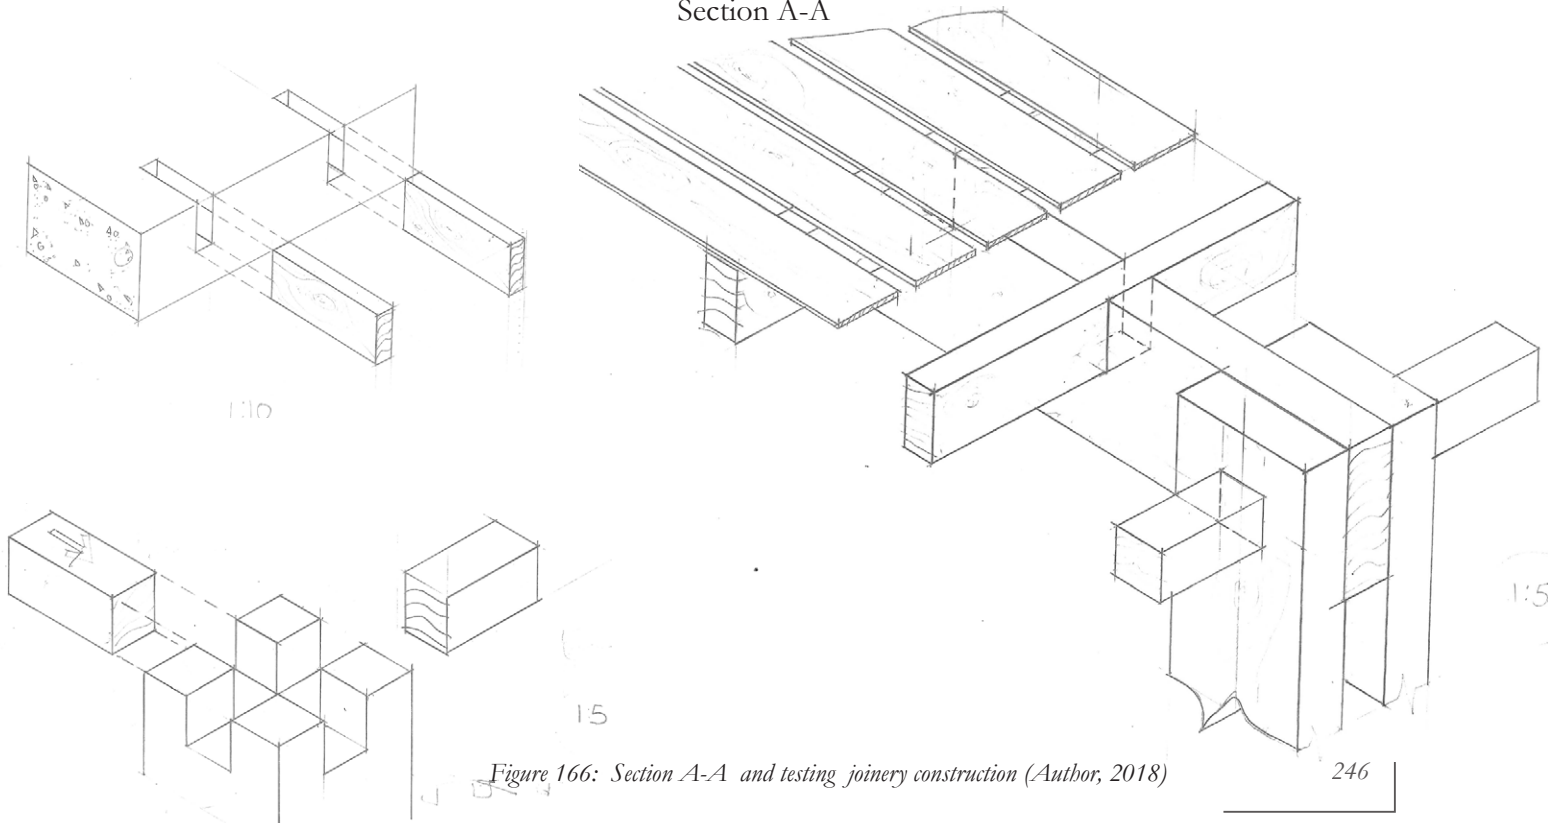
Section A-A and testing joinery construction (Author, 2018)
